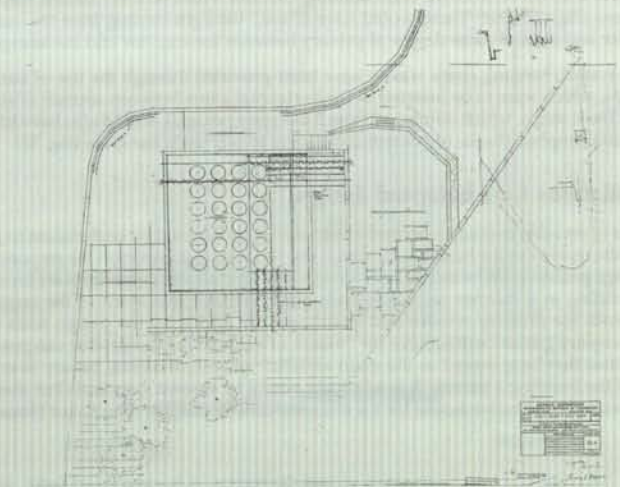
Moon Garden Room sketch (A.A. Archive - 1947)
